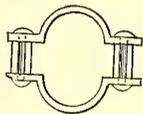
SECTION OF RIVETED POLE WITH U-SHAPED CHANNELS
